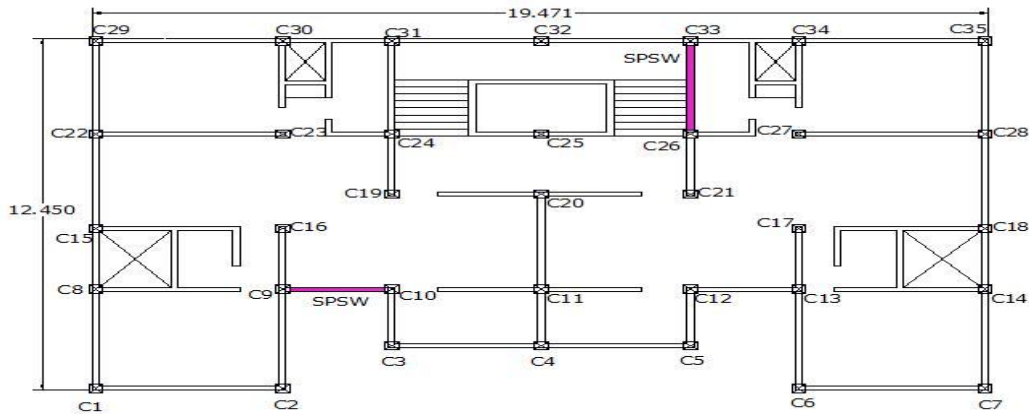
Plan showing Steel frame building with SPSW1 (Model 1)
